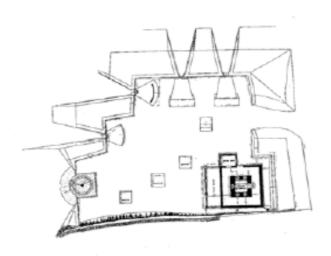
Plan of the Murray Battery (Rollo, 1991, p.9)
